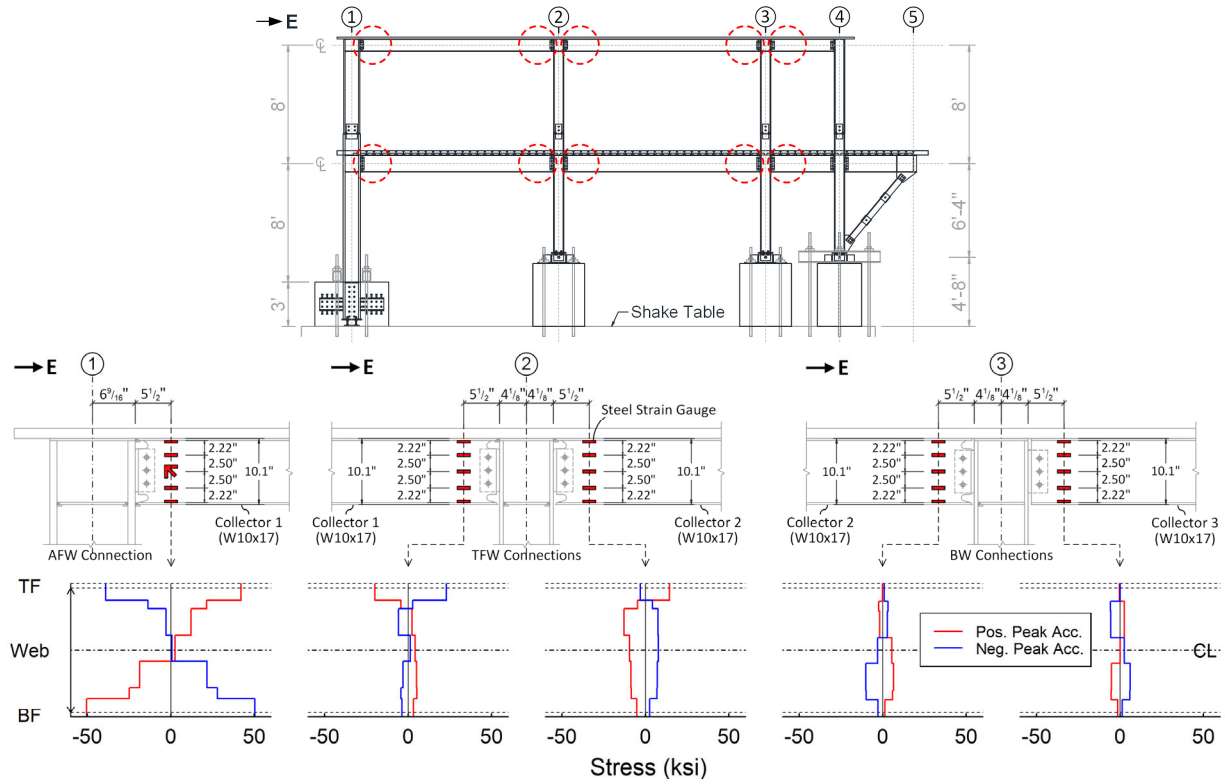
Test 2B-5: Fiber Section Stress Profiles of Roof Collector Connections
